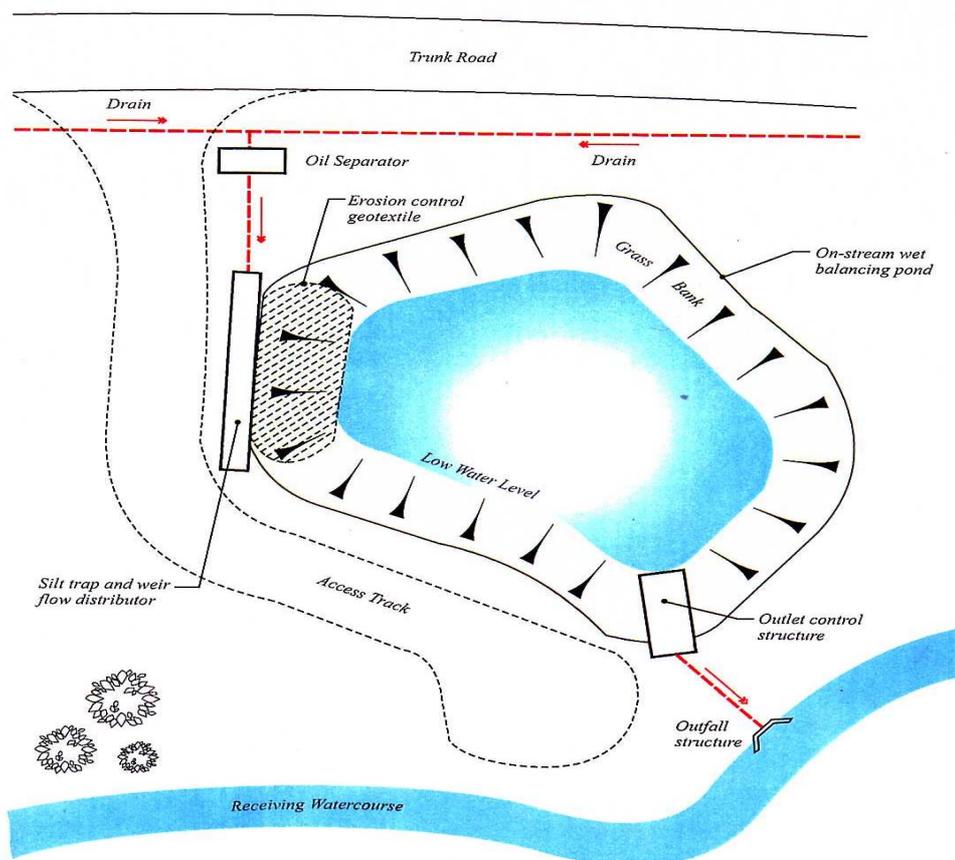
Original On-Stream Wet Retention Balancing Pond Before Retrofitting
